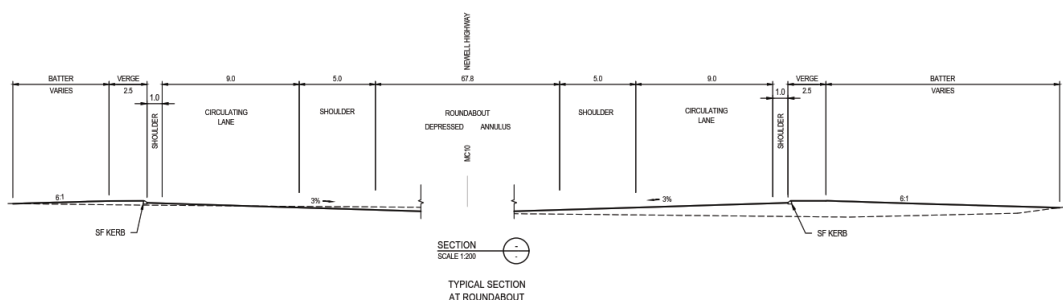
Cross section of the proposed roundabout at Condobolin Road
